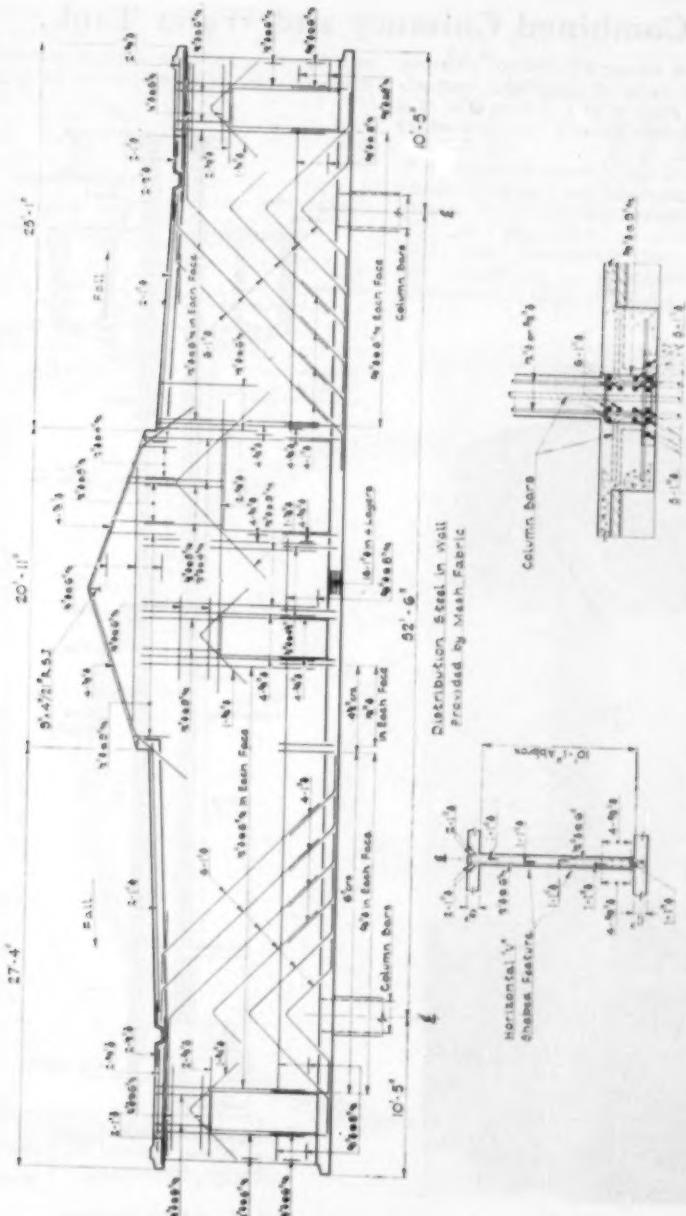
Details of a Typical Wall Acting as a Beam.
